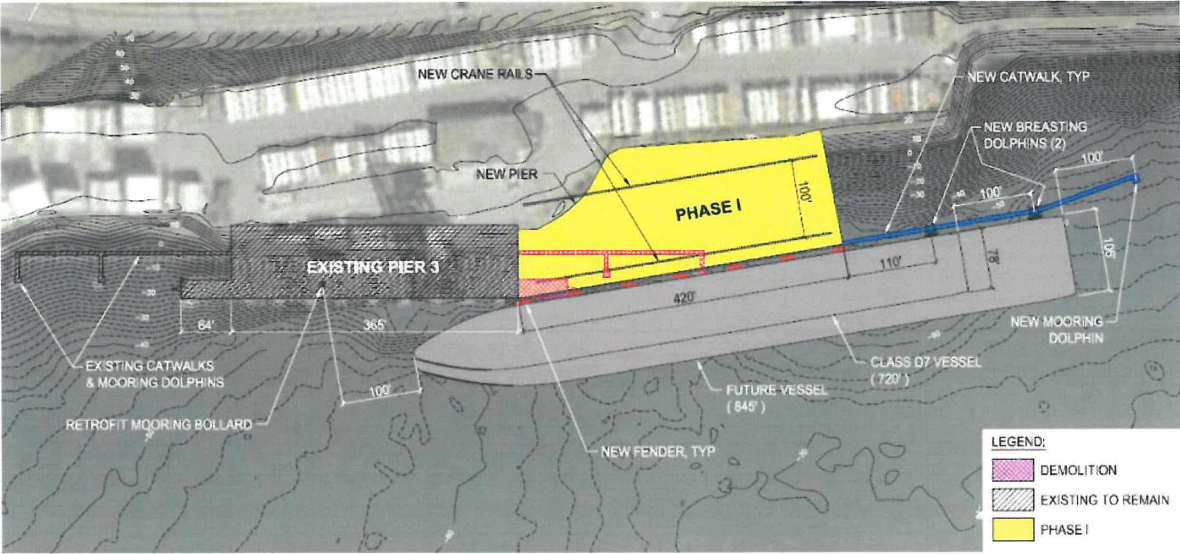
Kodiak Pier III Replacement - Option 1 - 420-Foot Dock East of Existing Dock
